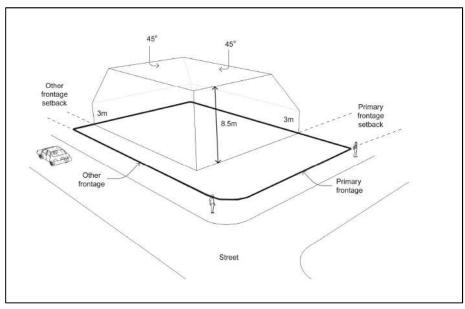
Acceptable building envelope for a corner lot in the General Residential zone (DIPS, 2013)
